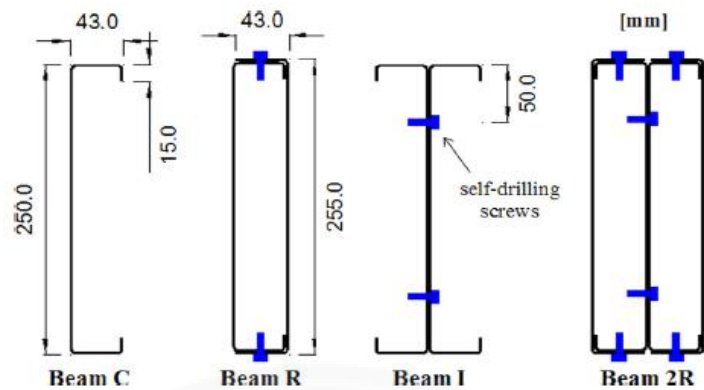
The cross-sections of the tested beams (Laim et al., 2013)
